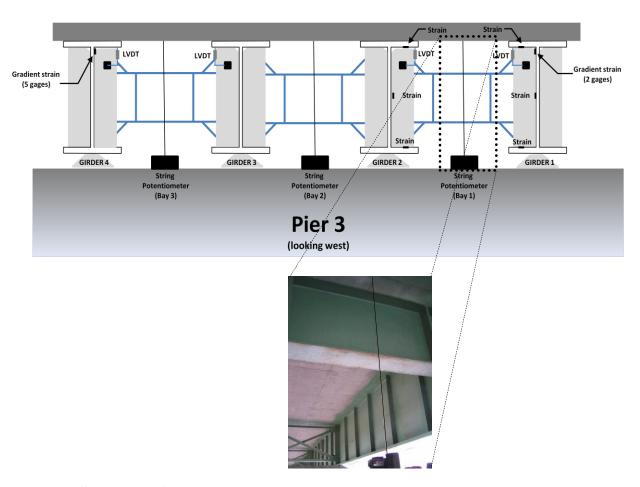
Schematic of the load test instrumentation at Pier 3 (looking west). Note that the three deck bay vertical displacements were made relative to the top of the pier cap beam.
